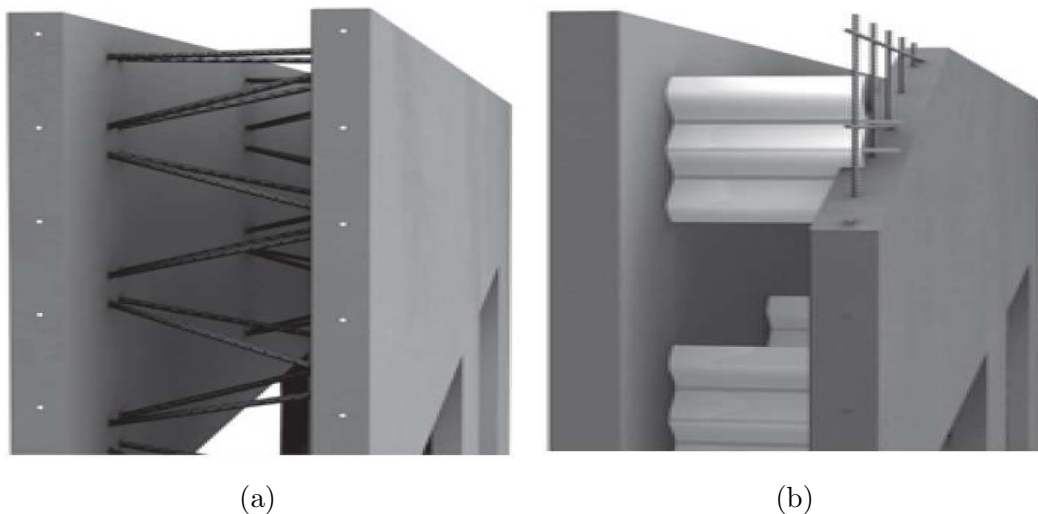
Double wall element with; (a) lattice girders; and (b) Kappema elements, taken from [36]
